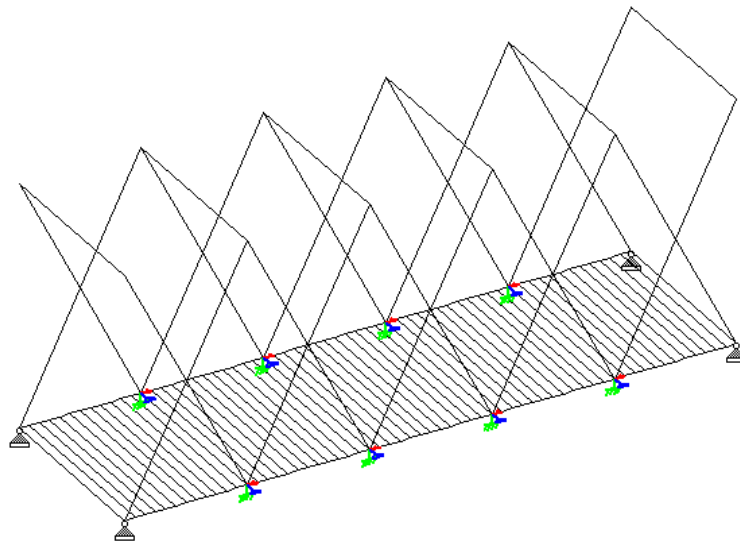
Plan view of Pedestrian bridge made up of Bamboo without stiffener -Case 1 (BC1)
